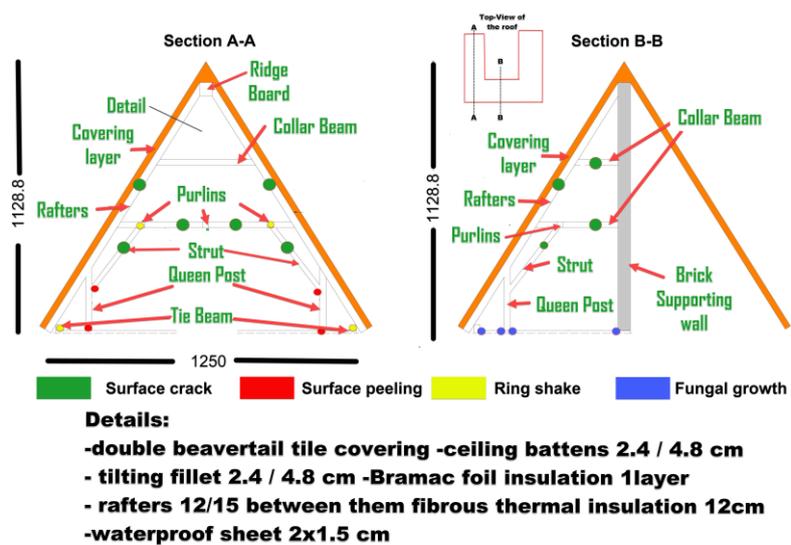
Positions of cracks and defects found in the roof of Civil Community House
